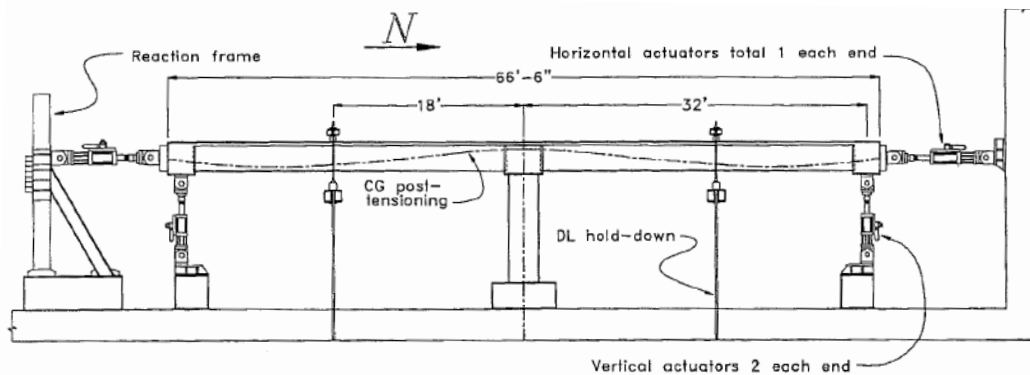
Spliced girder test setup (Holombo, 1999)
